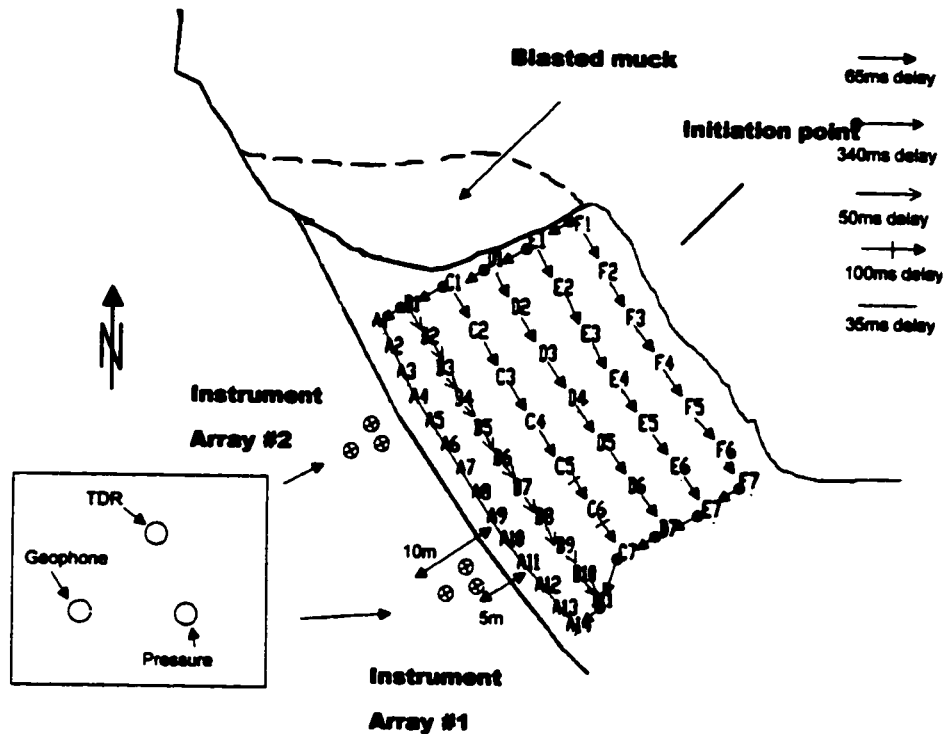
Blast layout, tie in and instrument location for the 345-40 wall control blast
